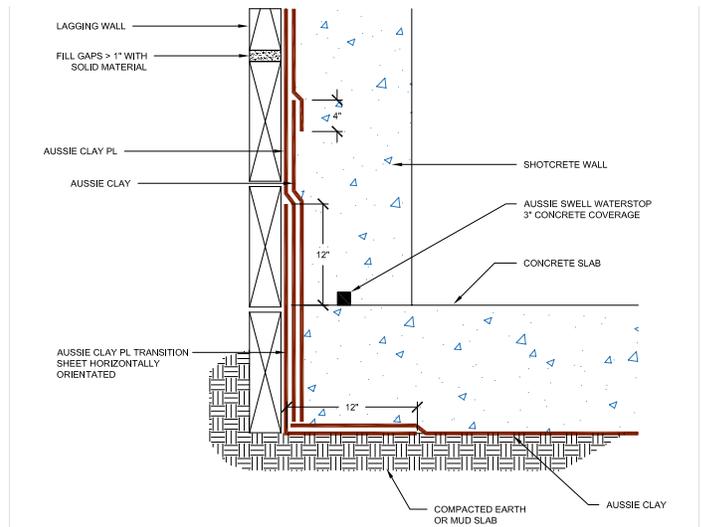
LAGGING WALL TRANSITION IN A SHOTCRETE HYDROSTATIC CONDITION
